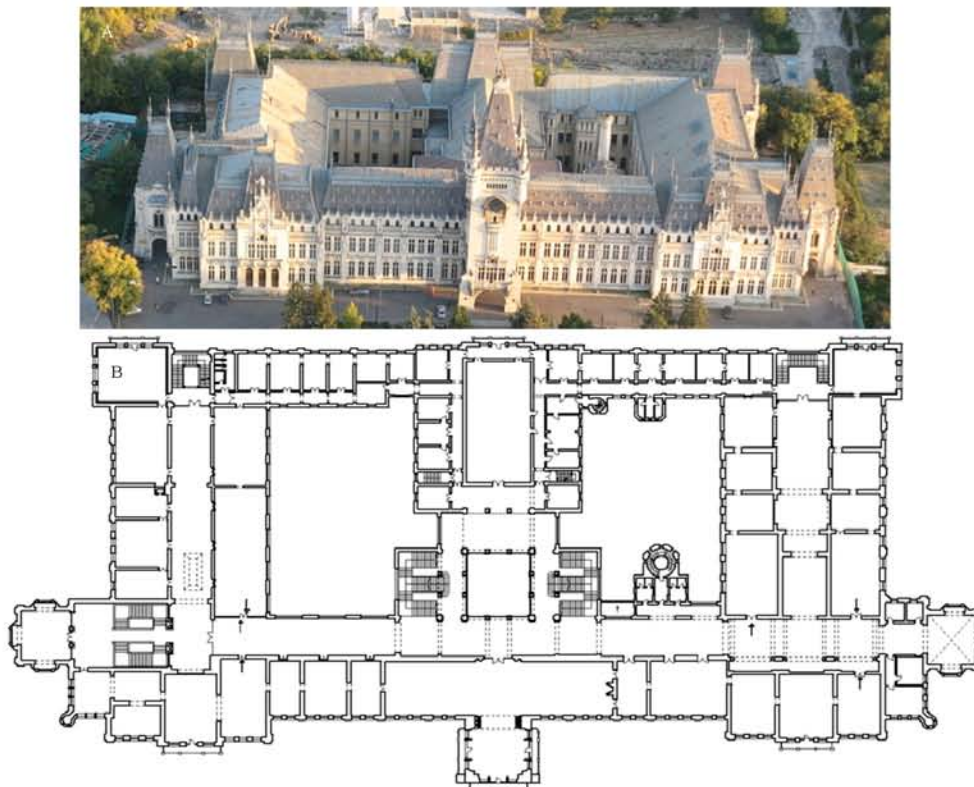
The Palace of Culture, (A) top view and (B) ground floor plan
